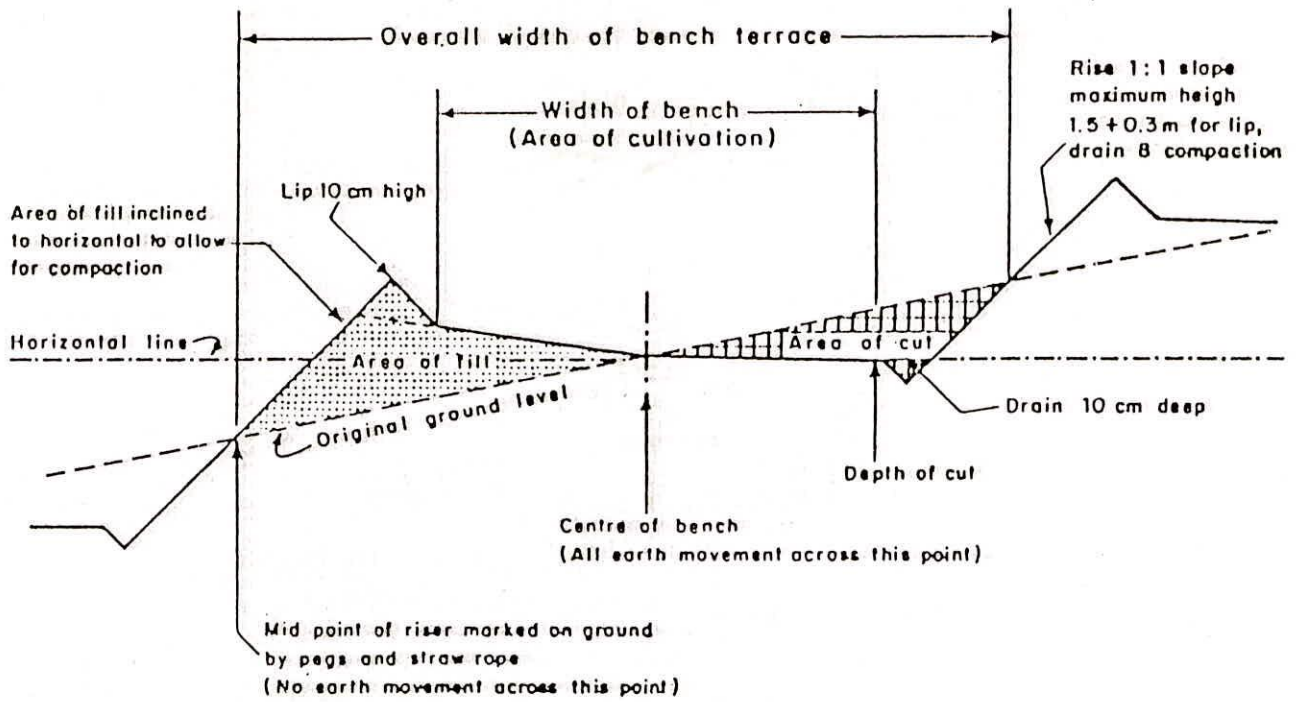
Typical cross section for back-sloping bench terrace.
